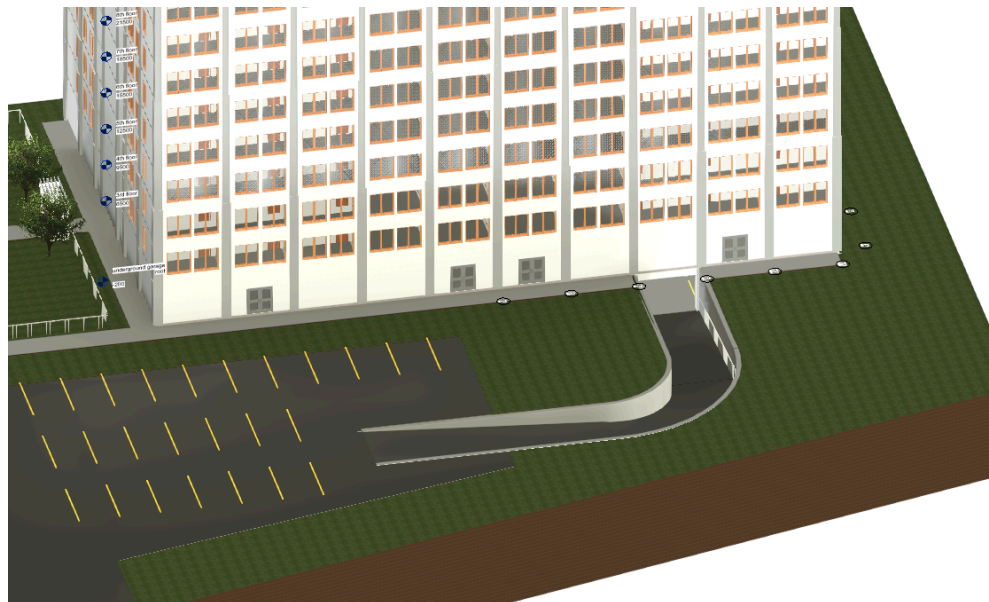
Revit 2025 3D view of the car ramp and underground parking entrance
